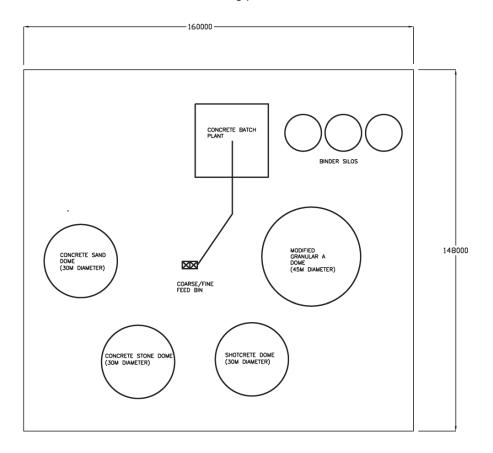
Aggregate Storage and Concrete Batch Plant Layout
